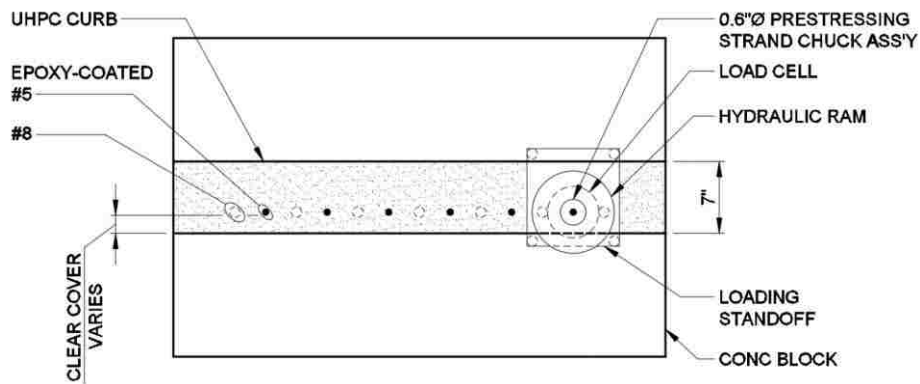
Plan view of a representative splice curb with testing apparatus shown on one specimen.
